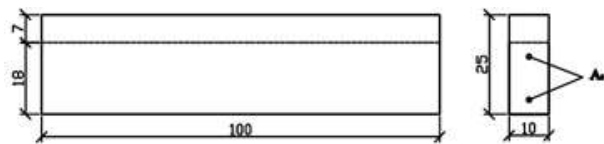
Sample model made of ordinary concrete *Figure 2. Sample model with additional complex modified concrete laid on top
